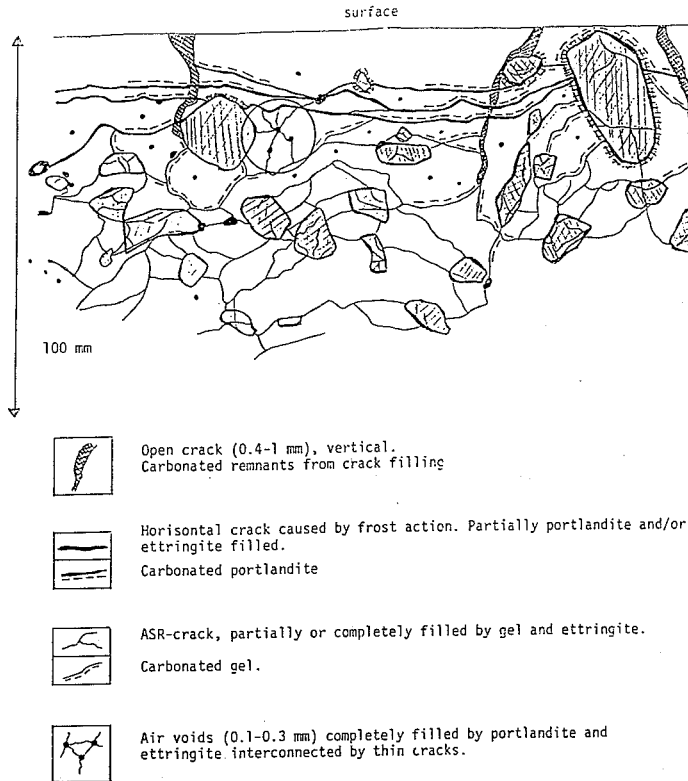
Sketch showing the crack pattern in a drill core from one of the bridge structures. The core was drilled perpendicular to the horizontal surface on a sidebeam. In the upper part the wide ASR-induced vertical cracks are overprinted by horizontal cracks caused by frost action. The framed area (circule) symbolize radiating cracks from ettringite and portlandite filled air voids. Shaded aggregates = reactive aggregates.
